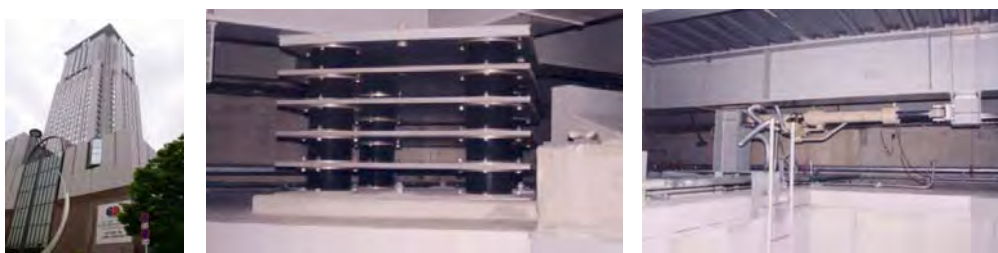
a) Overview of the “Applause Tower”; b) Support equipment of the platform; c) Hydraulic actuators
